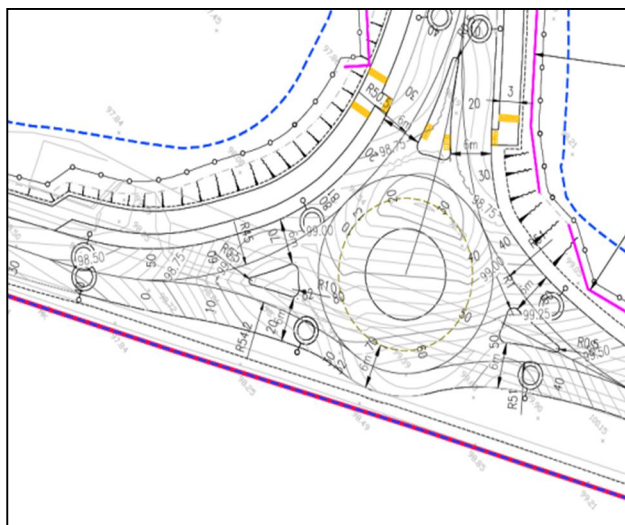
Roundabout design at Leighton Road using DMRB Volume 6 Section1 TD16/07
